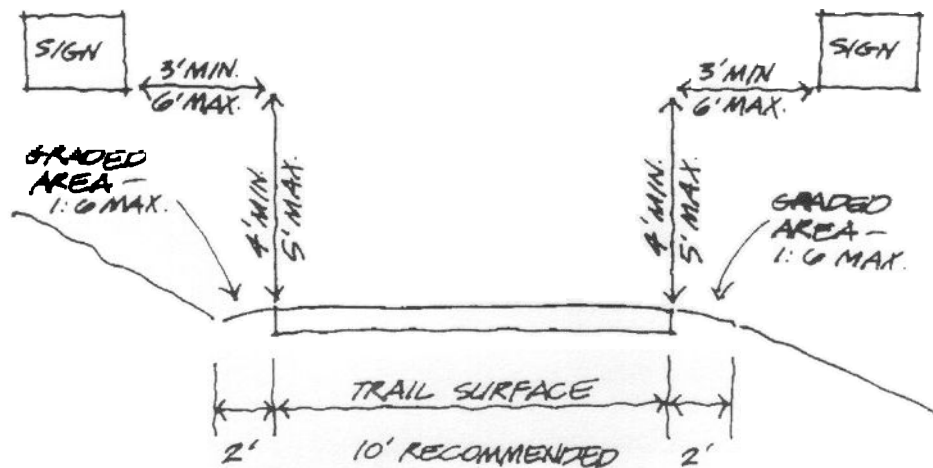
Cross-Section of Two-Way Shared Use Path on Separated Right-of-Way
